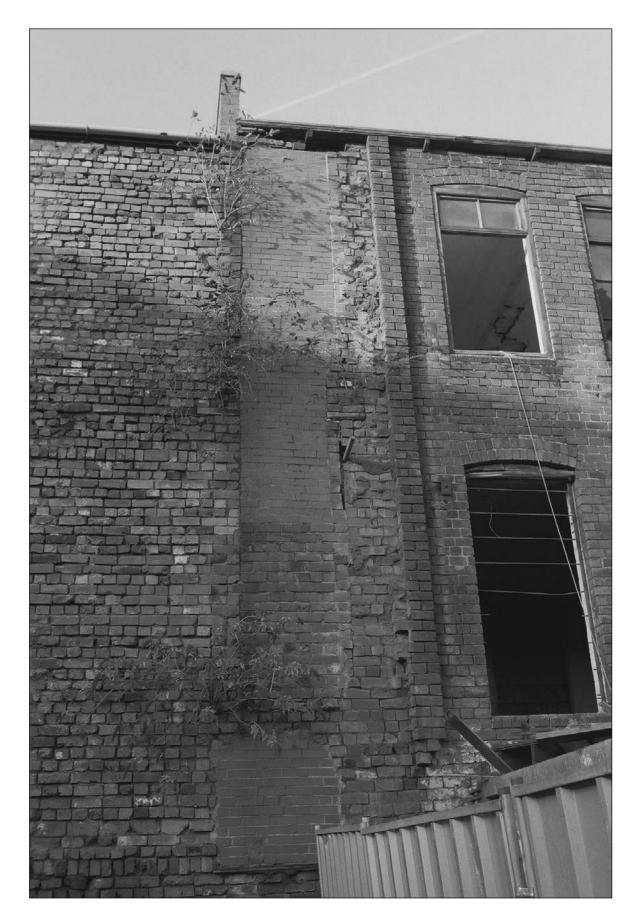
Detail of blocked primary openings, south elevation of south range (west end) (film 46.26)
